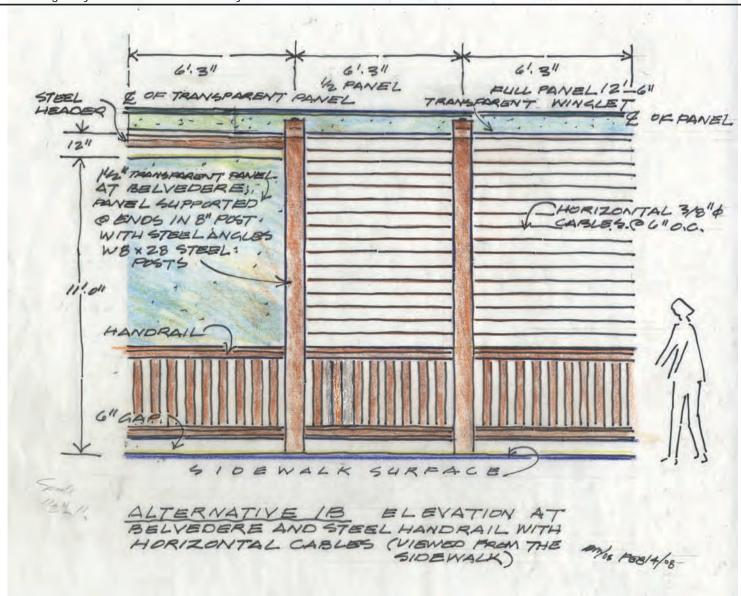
ALTERNATIVE 1B: ELEVATION AT BELVEDERE
